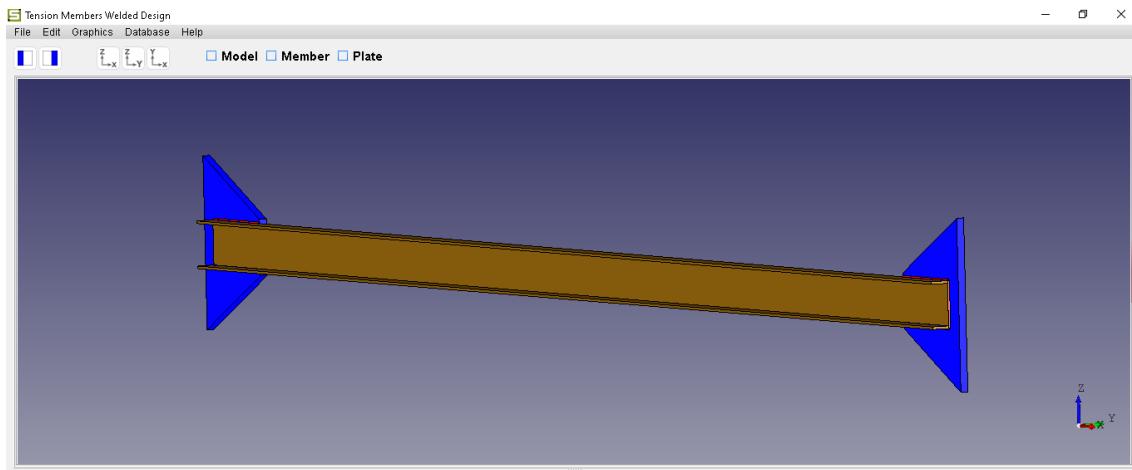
3D drawing output of typical Tension member Welded connection
